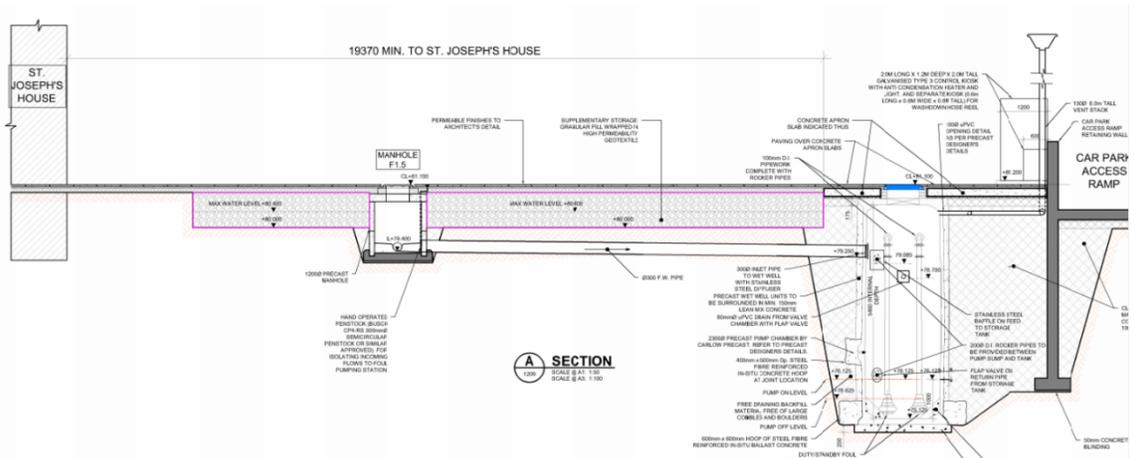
Extract from detail drawings of proposed Waste Water pumping station, prepared by Barrett Mahony Consulting Engineers, showing the minimal visual presence above ground and the distance between the proposed pumping station and the Protected Structure.
